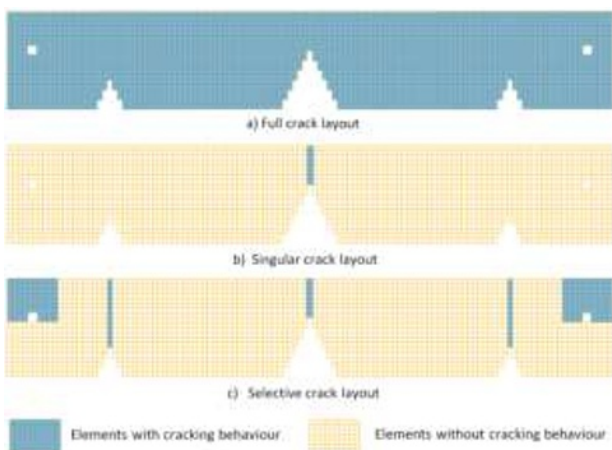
Finite element mesh layout showing the elements with crack material properties for: a) Full crack layout. b) Singular crack layout. c) Selective crack layout.
